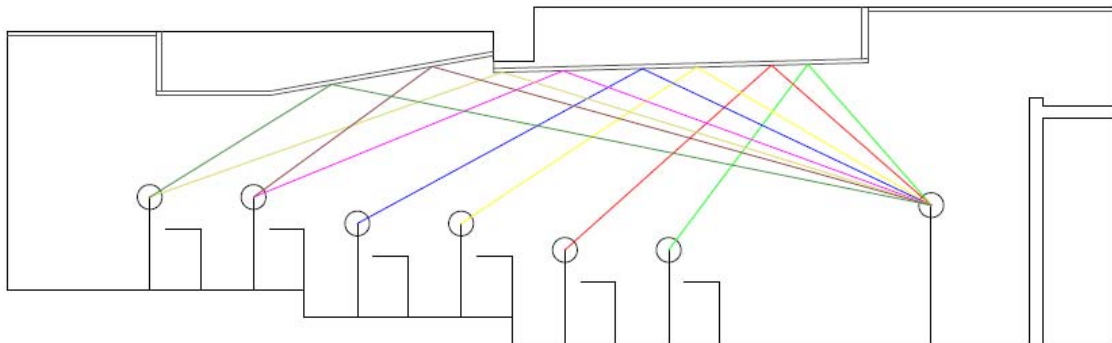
Section of Lecture Hall – Proposed Ceiling with Sound Reflection
